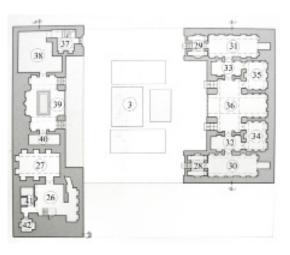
Basement Floor Plan of Razavi Khaneh-Hussainia (Mohamadzadeh et al., 2007)
